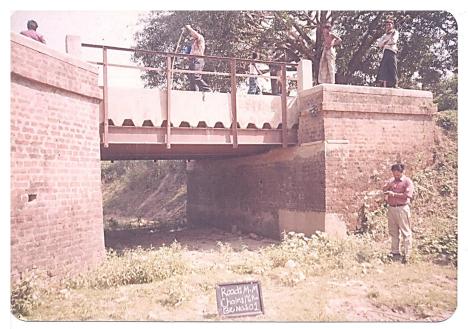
Steel through plate Bridge at Modhupur-Mymensing Highway
